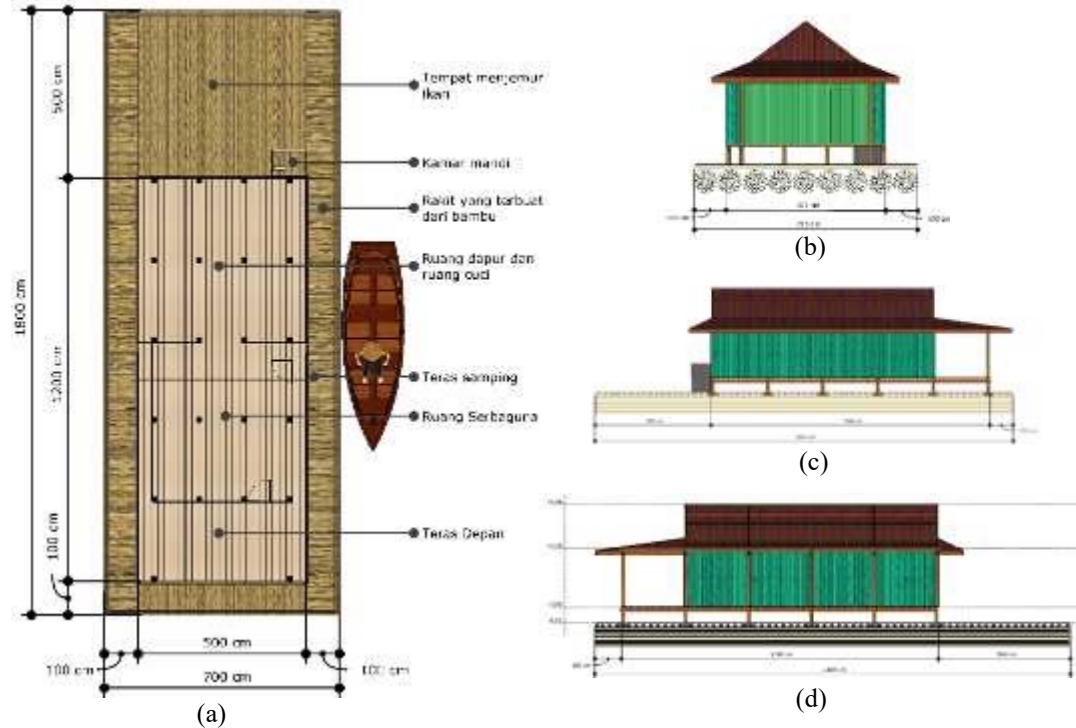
(a) Floating house plan, (b) Front view, (c) Side view, (d) Section
